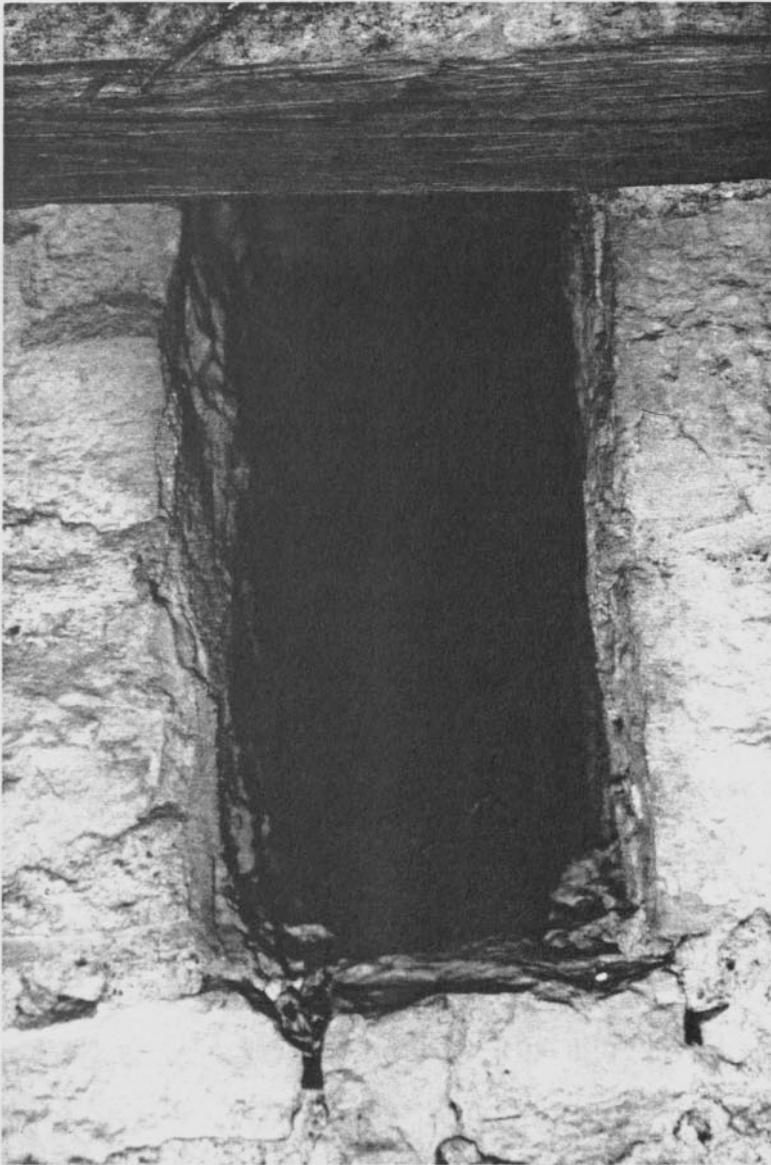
Detail of small vertical wall openings in central portion of Grimm barn
